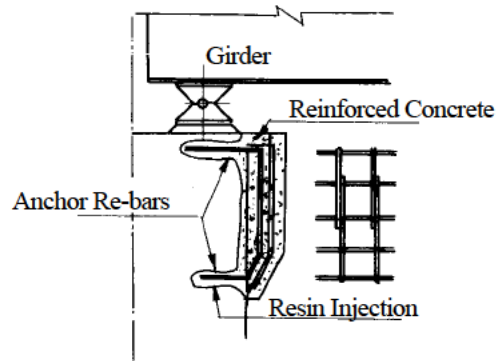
Widening of Seat Concrete (One side Widening)
